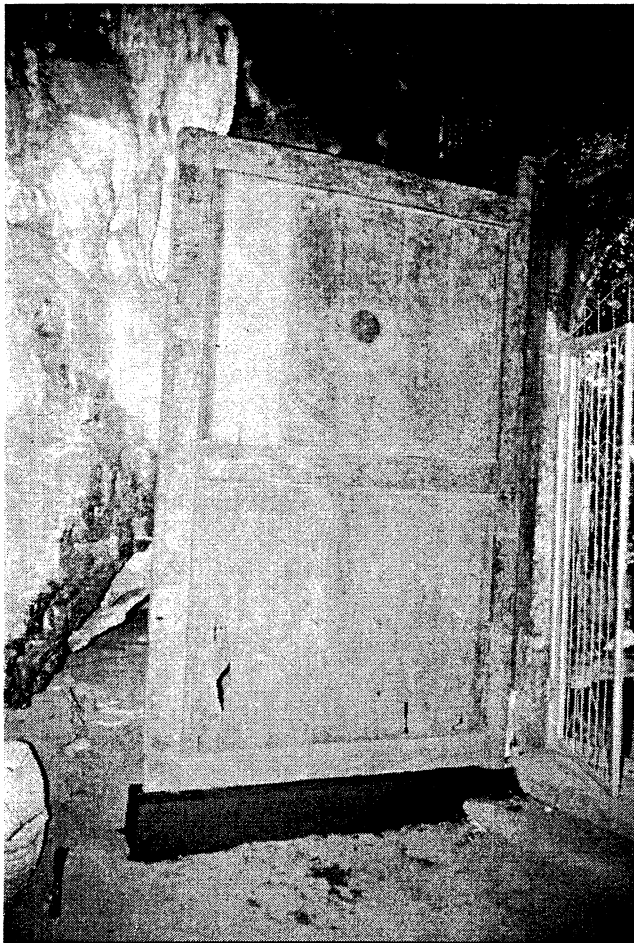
Upper cave entry door following erection and fixing in place with metal stirrups in an open position.
